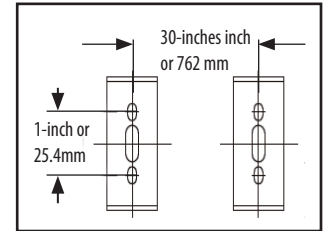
Installing the Mounting Brackets to Hang the Luminaire.
